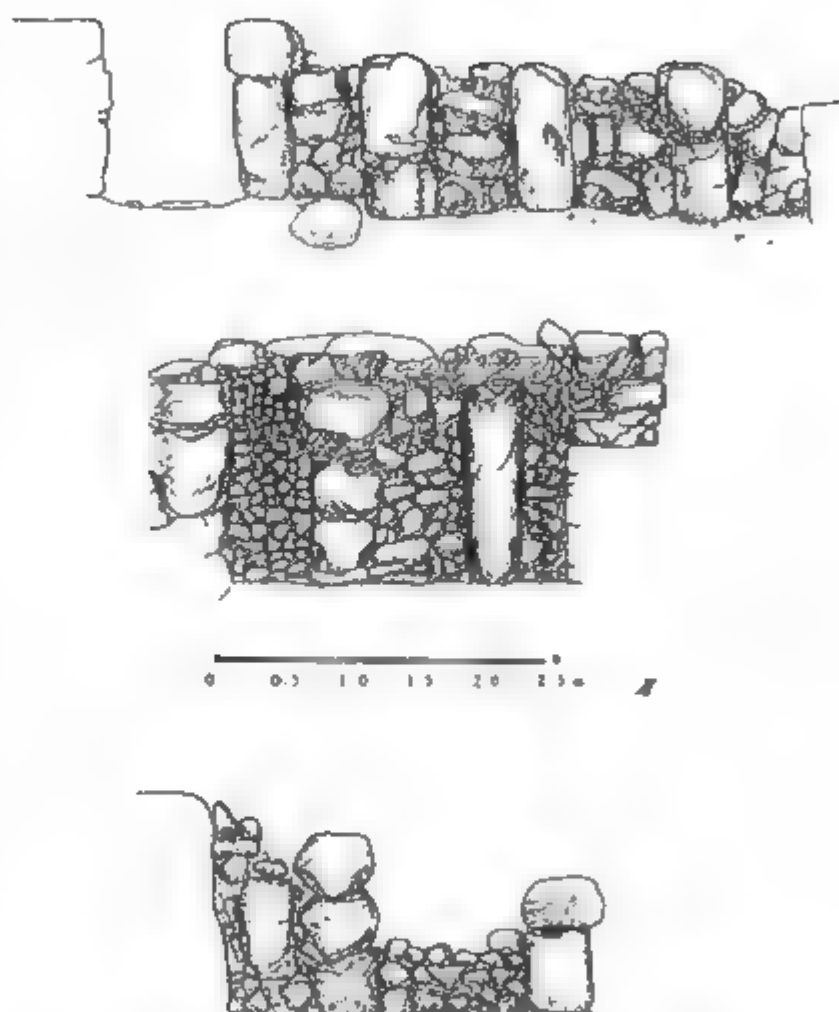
a, c* Stacked boulder walls: *a* rectangular pillars with boulders connecting them; Wall 1; *b* variation of pillar types; Wall 2; *c* rounded boulder pillars; wall with boulders connecting them; Wall 3.
